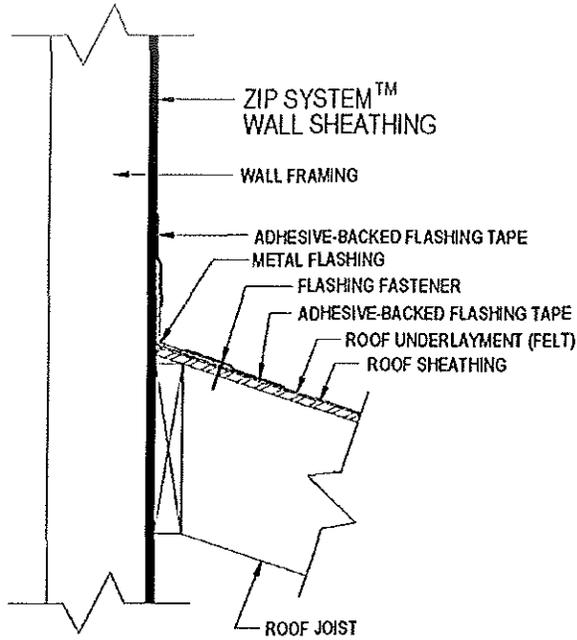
ROOF-WALL INTERSECTION (OPTION 1)
